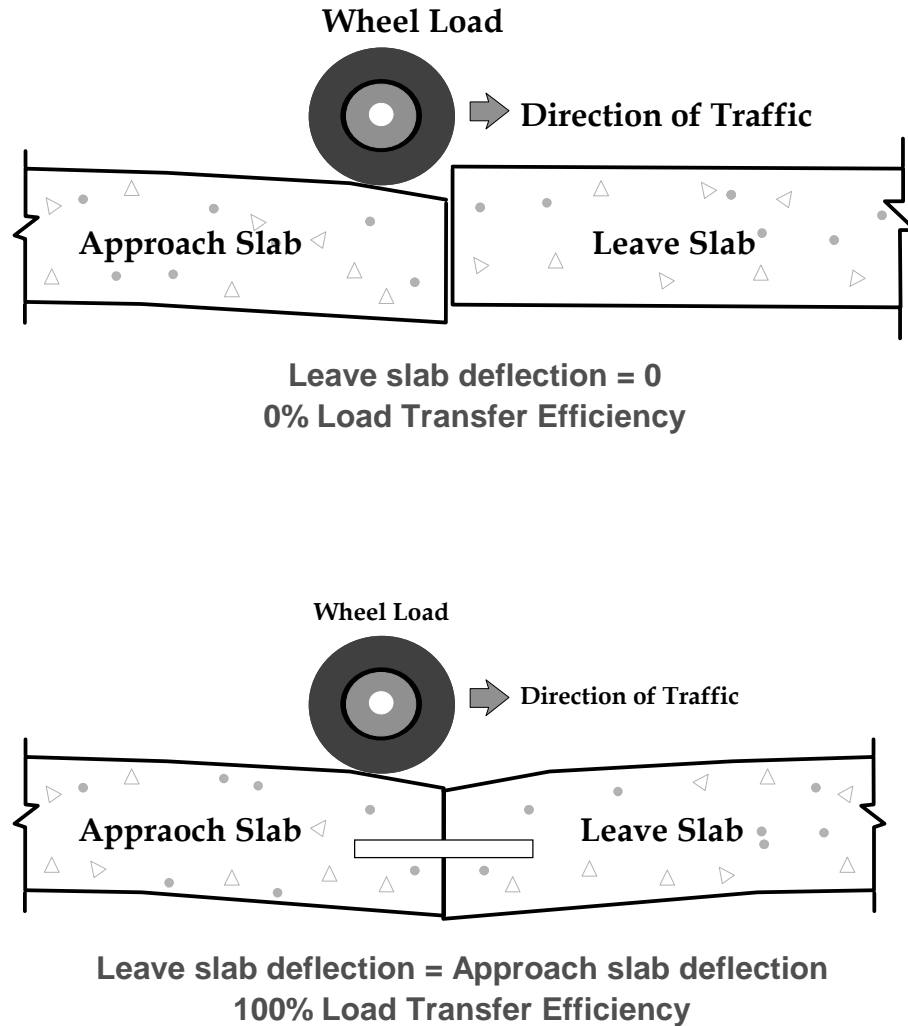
Illustration of poor and good load transfer across a joint.
